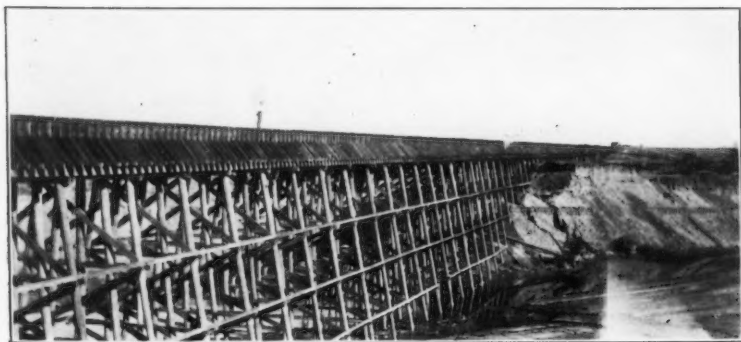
WOODEN FLUME OVER NEW RIVER BARRANCA.
